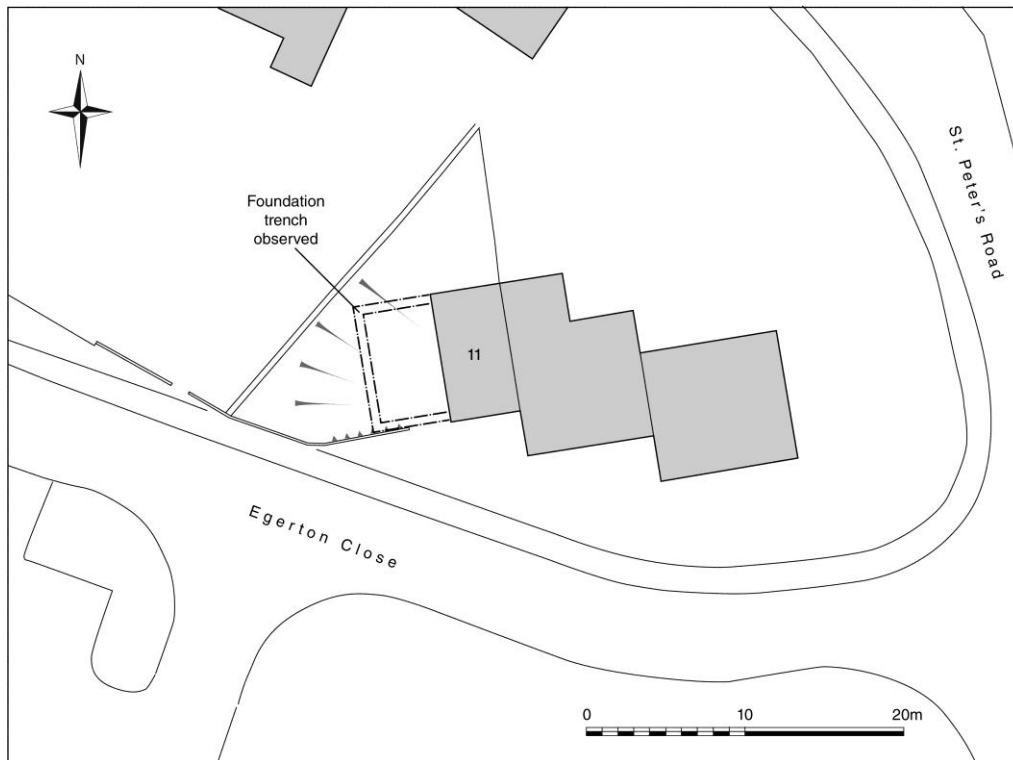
Plan with location of foundation trenches and hachures showing terracing (Andy Isham, after Roger Coy Partnership, with thanks)
